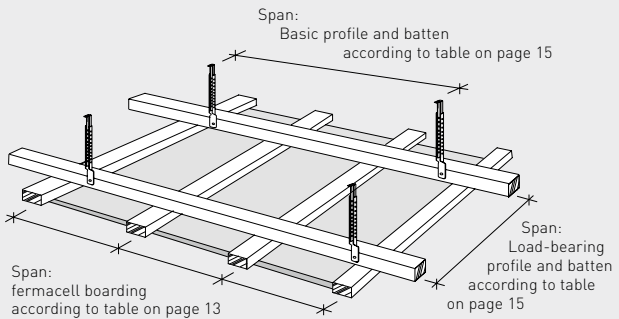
Suspended ceiling – layout of basic and load-bearing battens (corresponds to steel profiles)
